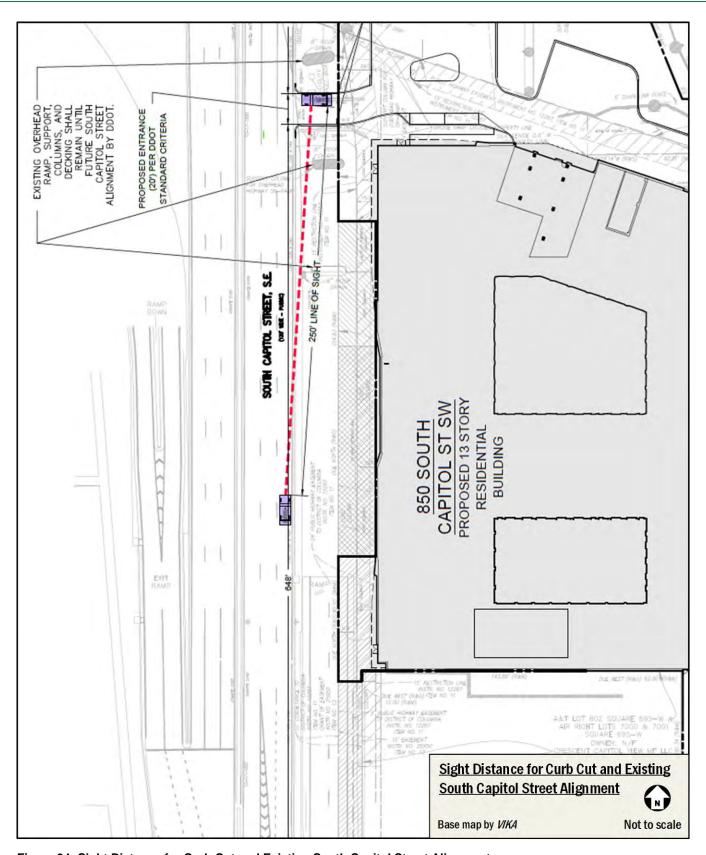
Sight Distance for Curb Cut and Existing South Capitol Street Alignment
